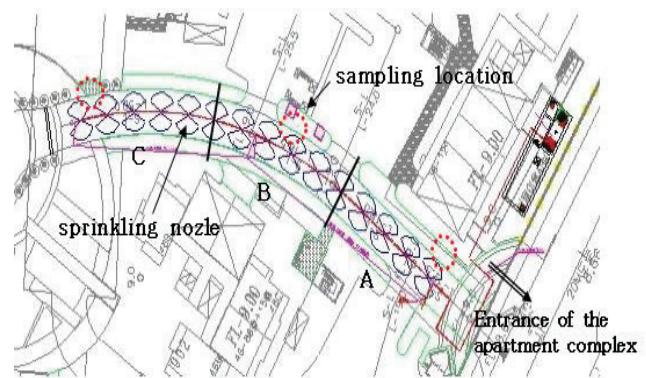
Plan view of road surface sprinkling system and sampling locations at study area.
